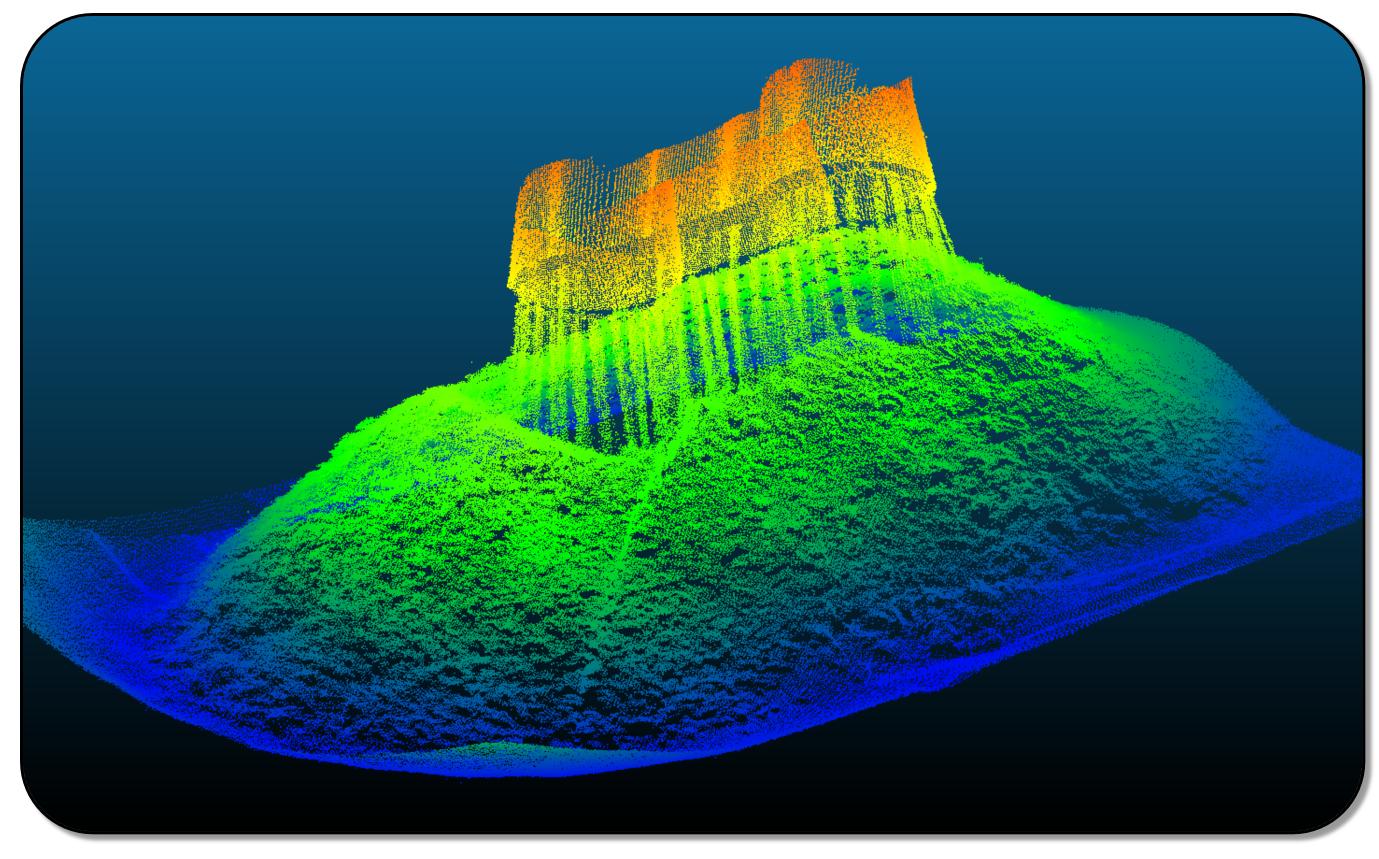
Perspective view of Pier 12 point cloud (looking from the northeast direction).
